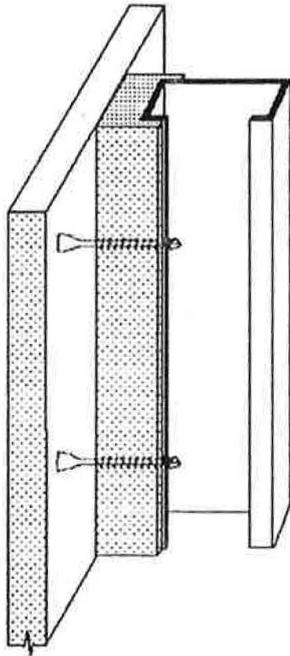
Screw installation of wallboard or sheathing into an insulated steel C-section assembly.
